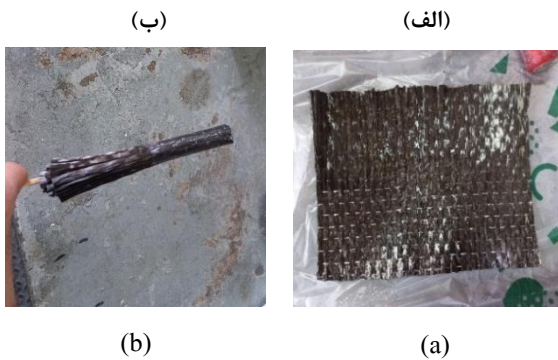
Steps of anchor construction: (a) cutting CFRP to required lengths; (b) rolling the anchor around the dowel
